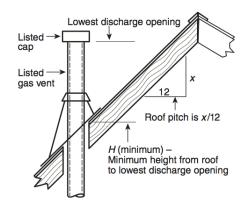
Termination Locations for Gas Vents with Listed Caps 12 in. (300 mm) or Less in Size at Least 8 ft (2.4 m) from a Vertical Wall.
